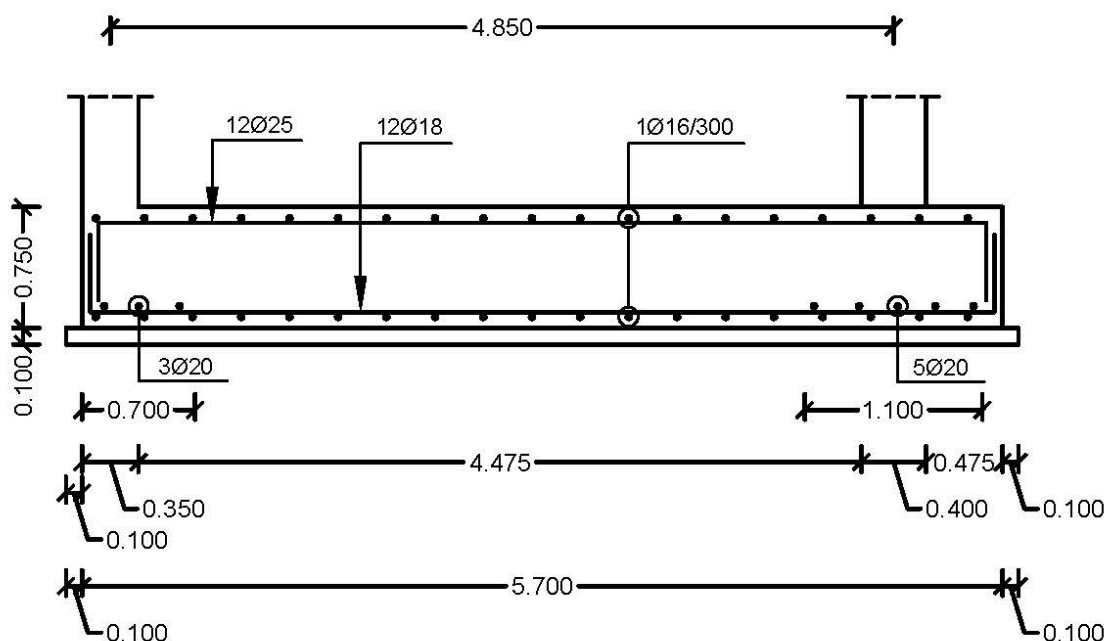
Combined footing details, $h=750 \text{ mm}$
